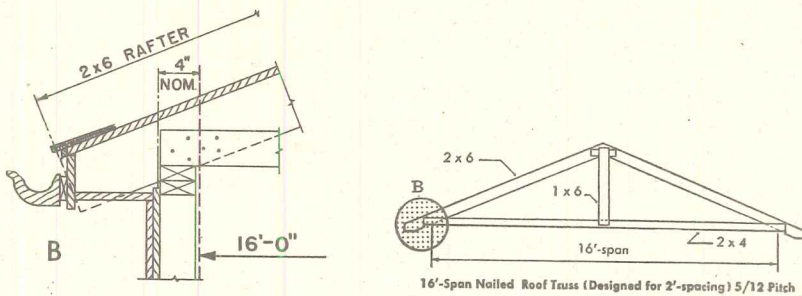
Pre-assembled roof trusses simplify modular construction; spans and 2-ft spacing correspond with 4-ft module. Detail B, above left, shows joining of truss with nominal 4-in. stud wall
